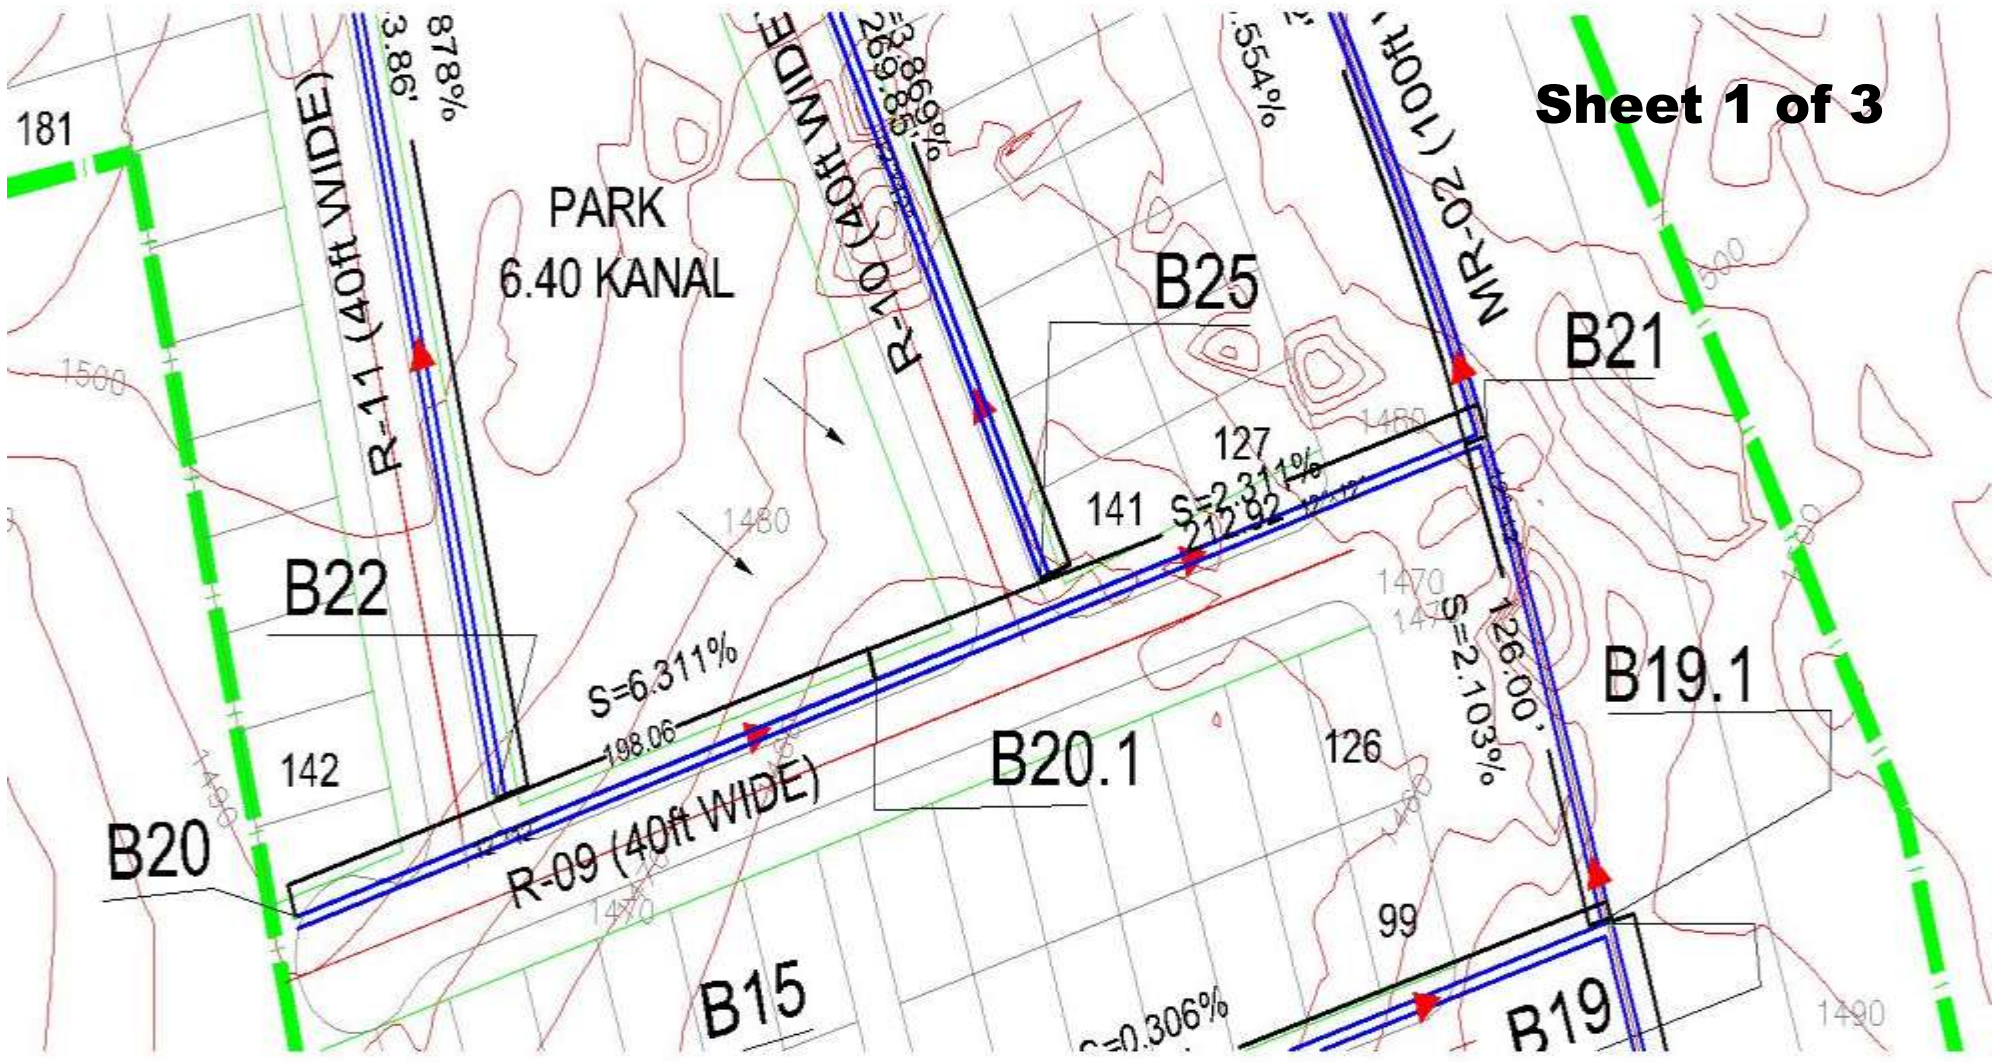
Storm drainage layout plan of Sub-catchment-1 showing final disposal node B2.6
